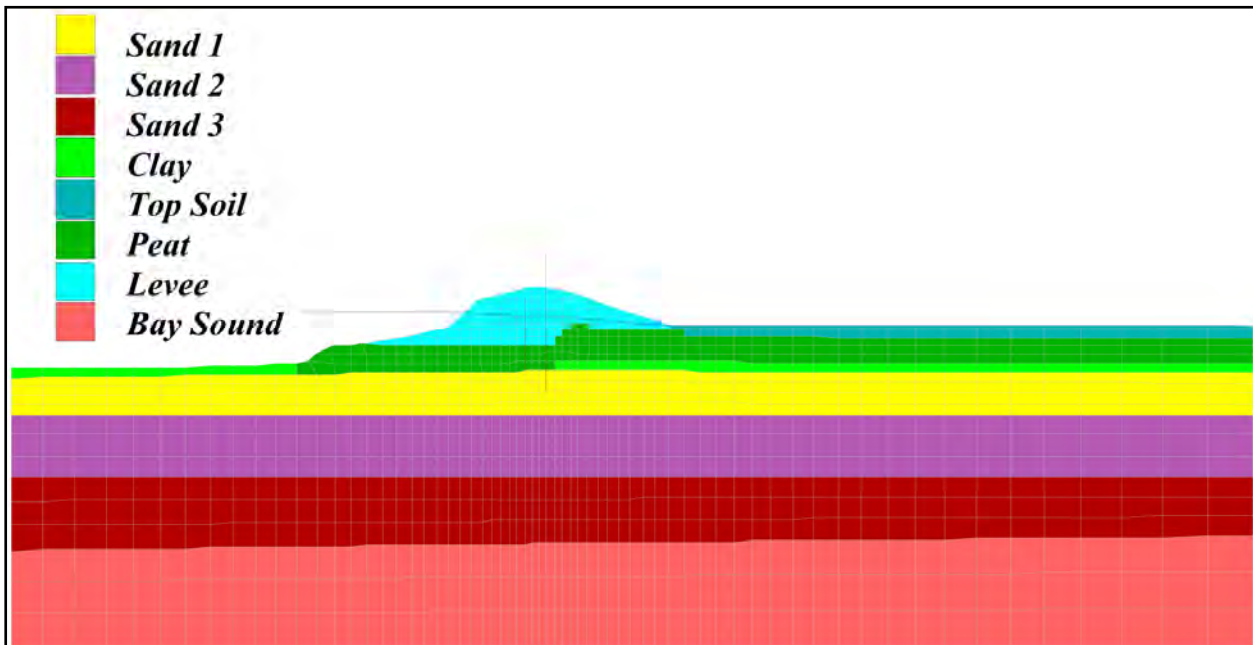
Soil zones, levee wall and sheet piles at normal pool for London north breach sta. 14+00
